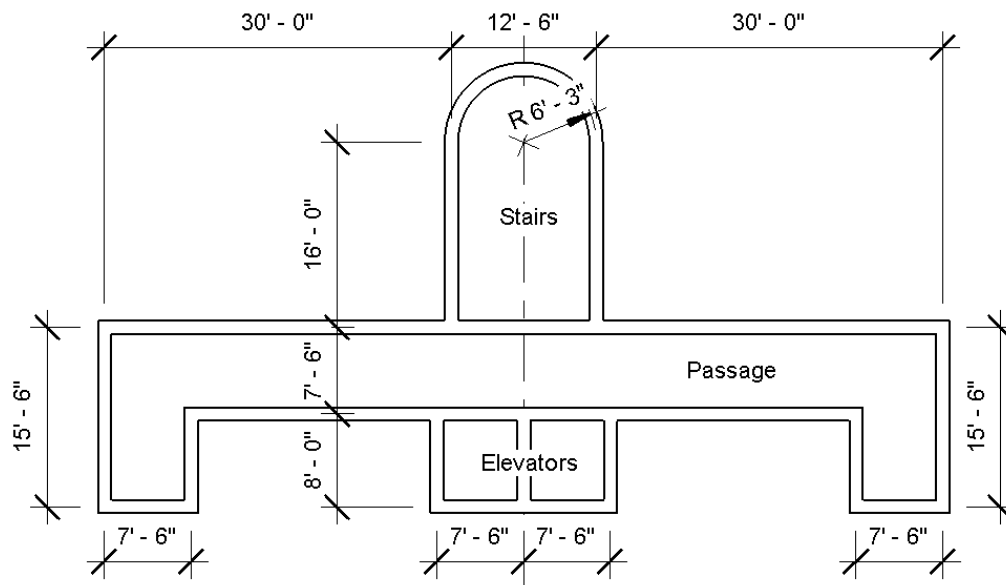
Sketch plan for creating the exterior walls for the *Elevator and Stair Lobby* project
